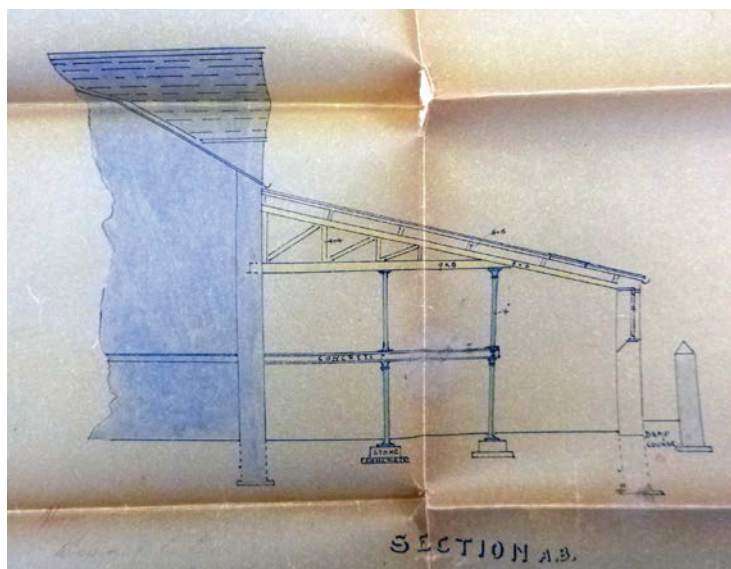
(left): Section for proposed addition to the Old Brewery, 1912
